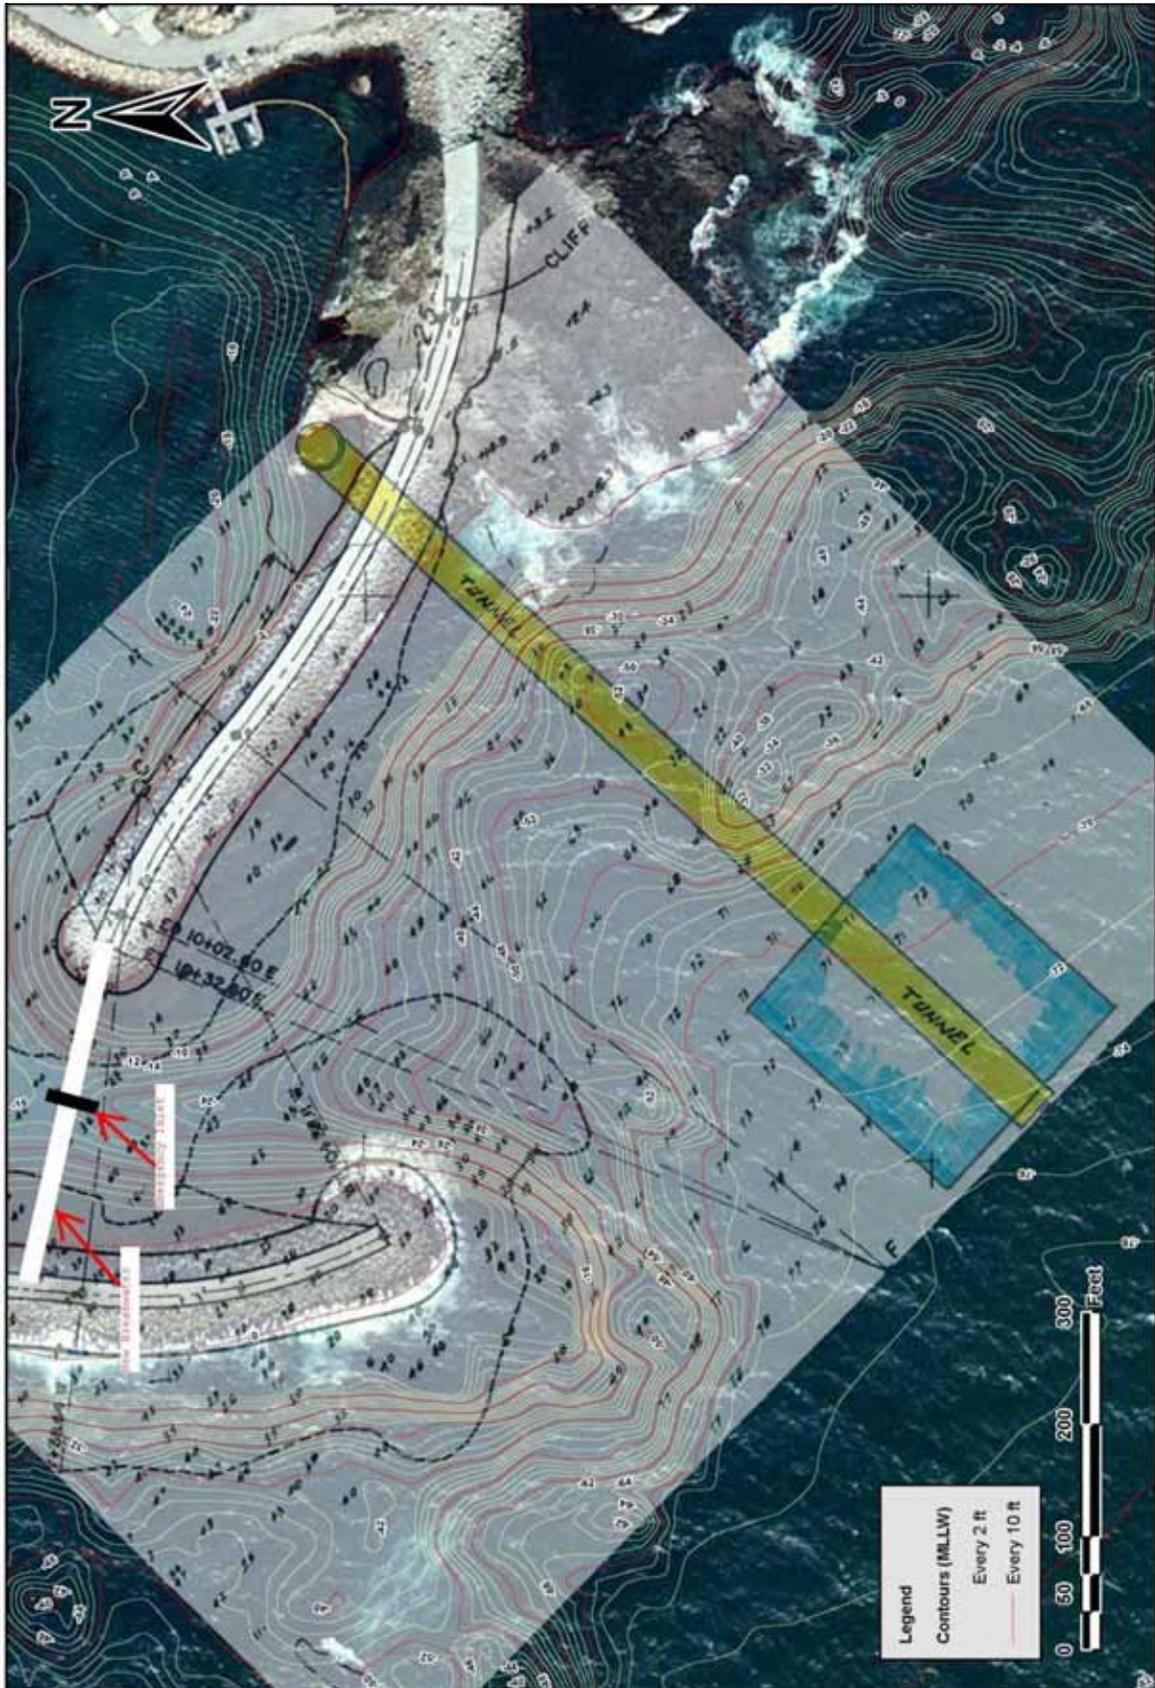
DCPB Bathymetry/Tunnel for 6-mm-Slot Screen Layout (Contour elevations = feet below MLLW)
